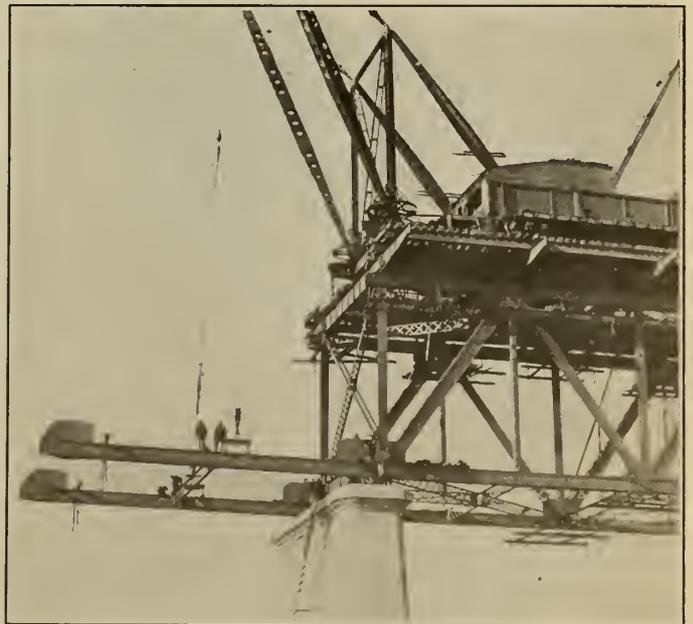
South Approach—Cantilever Erection of 245-foot Span—First Stage.
